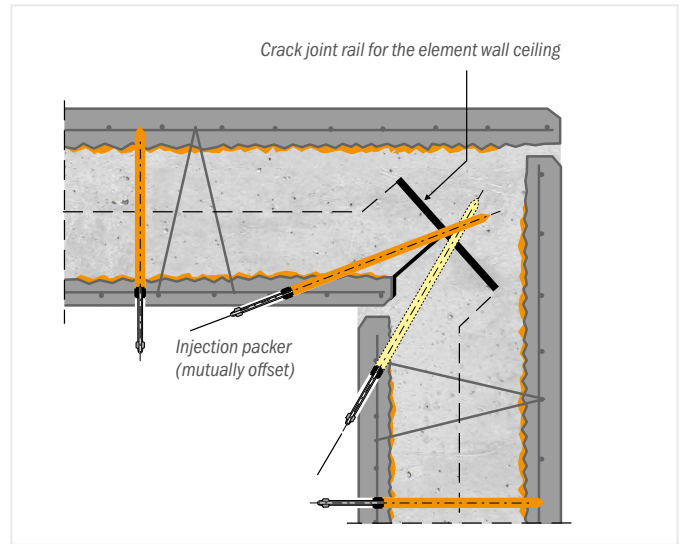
Subsequent sealing of an element wall ceiling with a predetermined crack joint rail [7]
